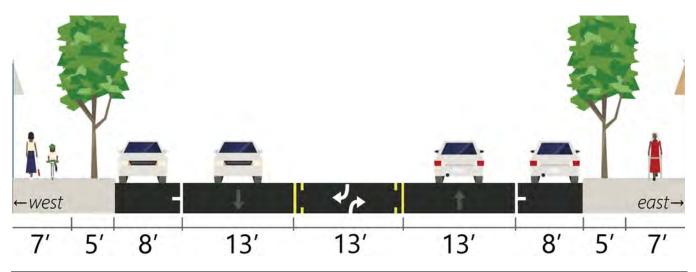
Cross Section of 3rd Street from NW Harwood Avenue to NE Juniper Street
